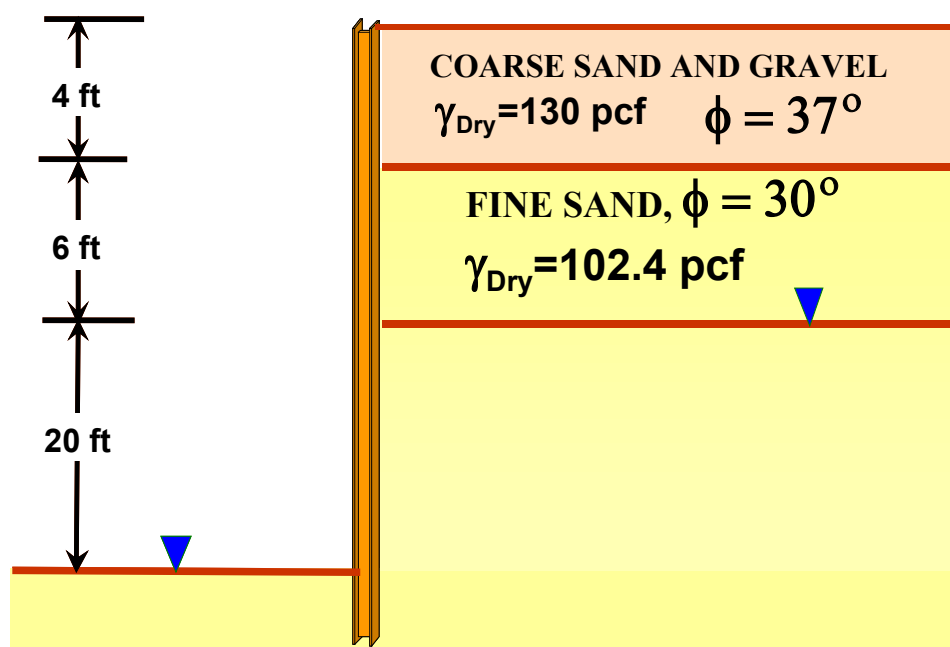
Diagram of Shoring Cross Section and Soil Properties
